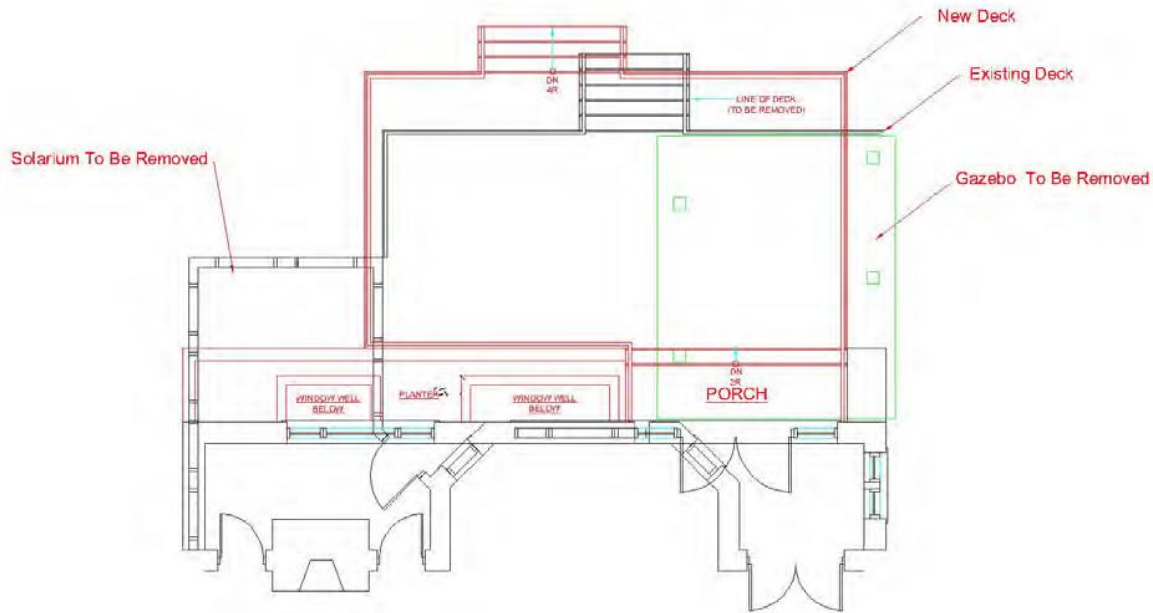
EXISTING PLAN (IN BLACK) AND PROPOSED SITE PLAN (IN RED)
